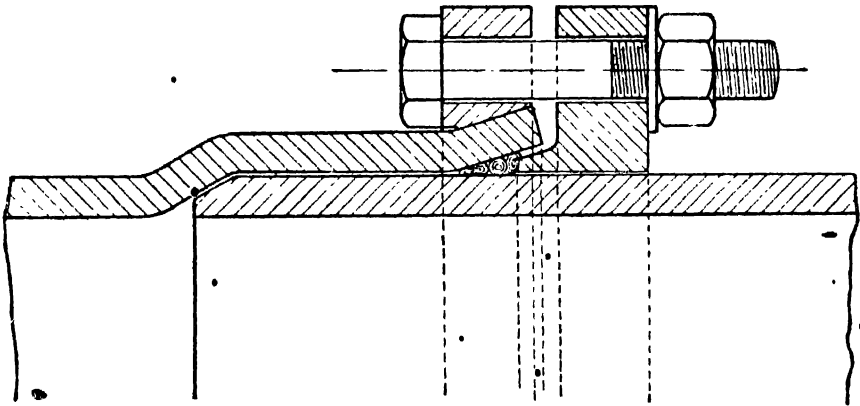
Single Muff Joint for Welded Steel Pipe
